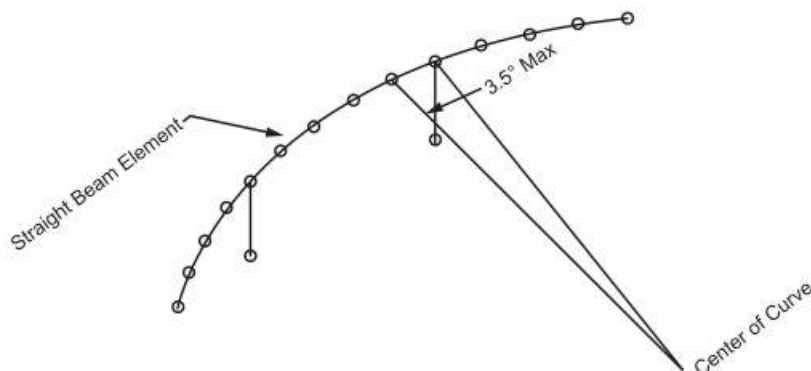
Three-Dimensional Spine Model of Curved Concrete Box Girder Bridge
